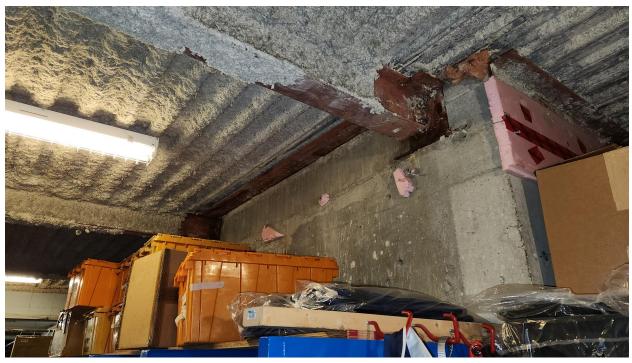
Ground Floor structure at the southwest stair addition (c.2000).
